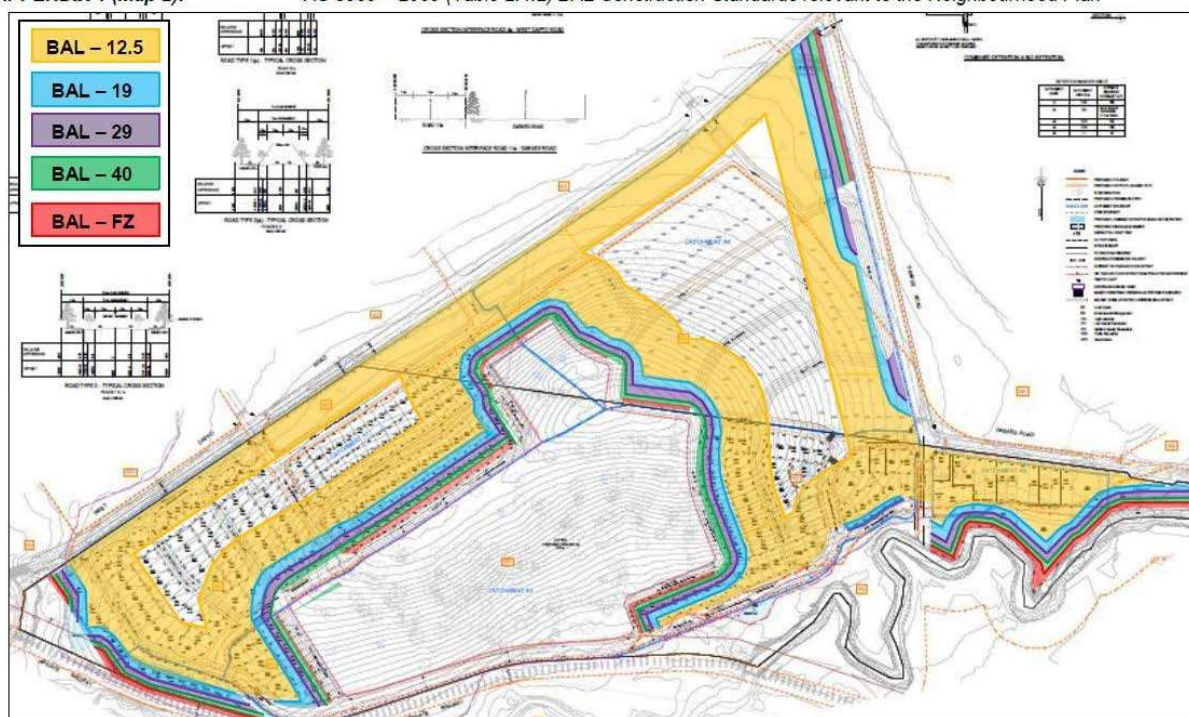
BAL Construction Standards relevant to the Neighbourhood Plan
